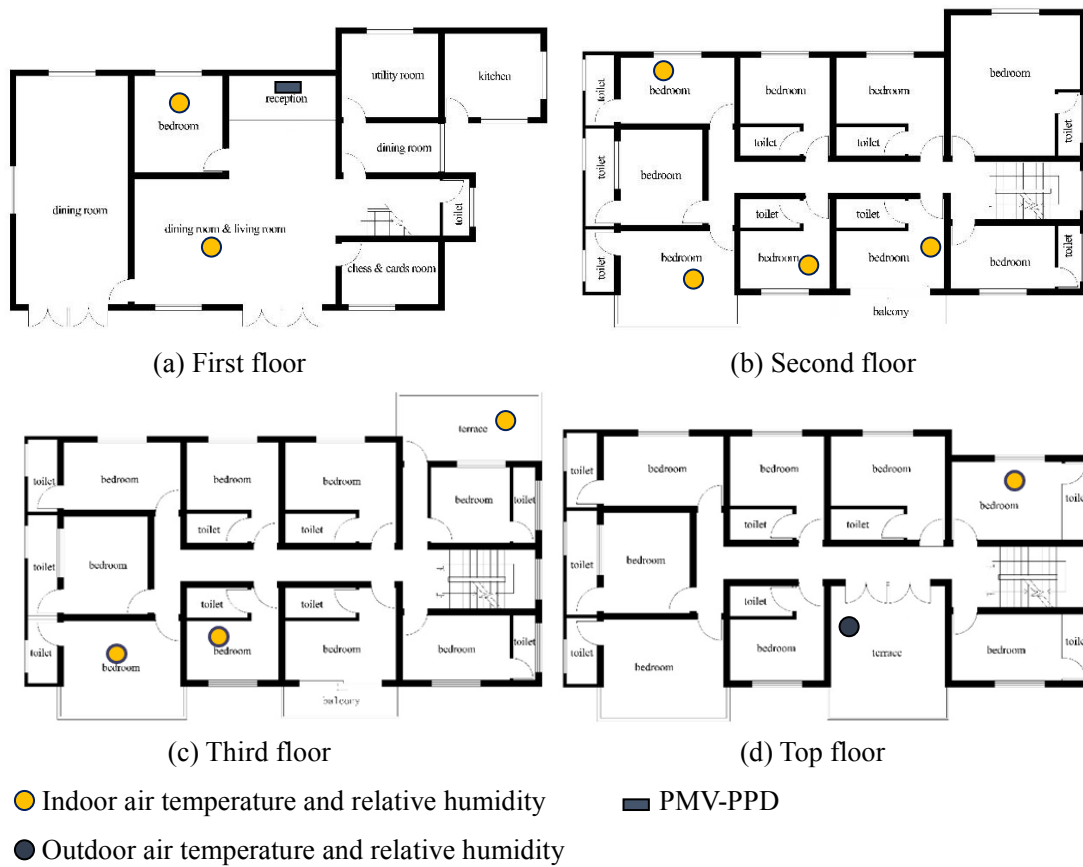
Typical building plan and measuring point distribution (MB-2)
